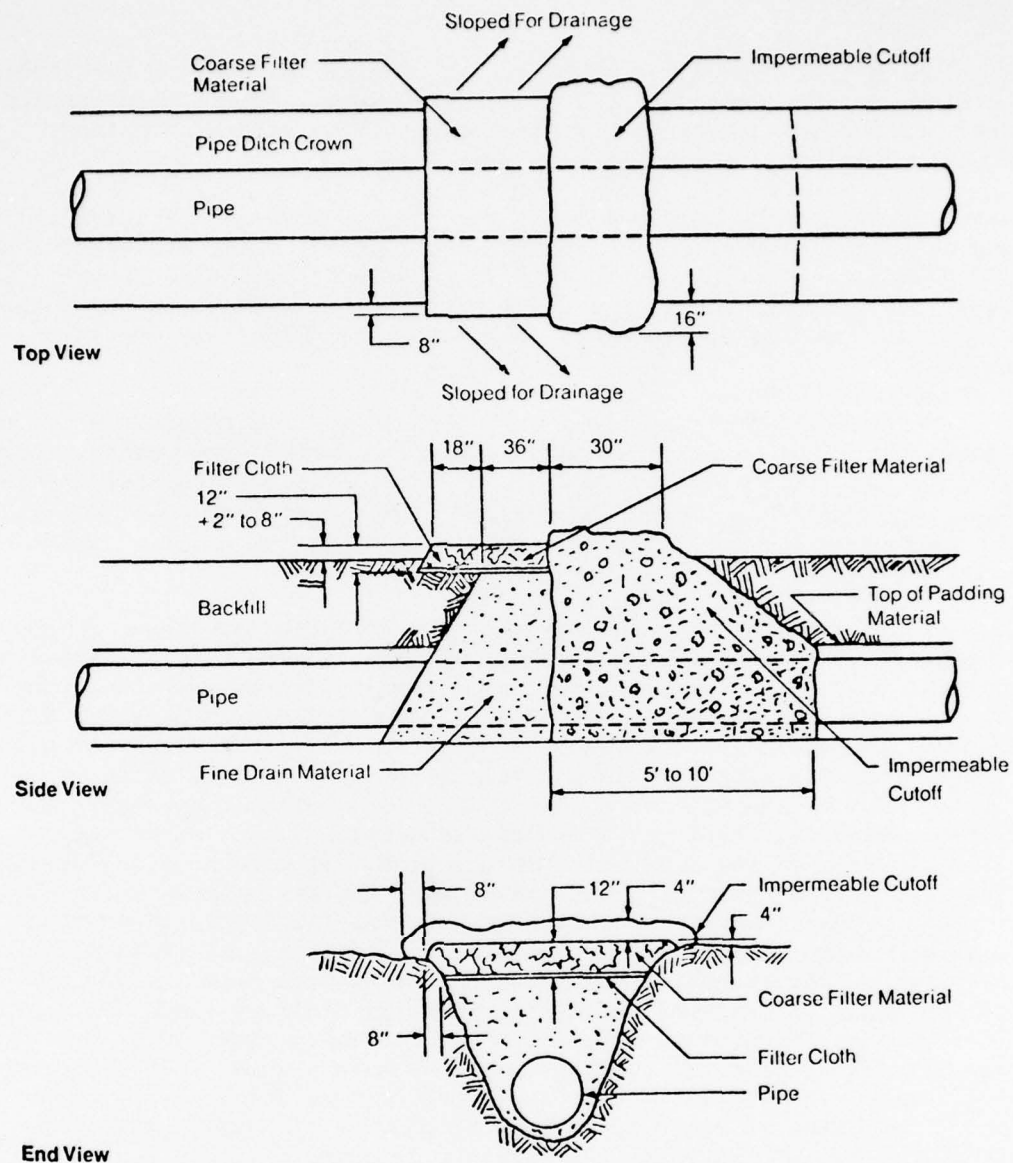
Drawings of pipe ditch plug and typical installation used to protect buried sections of pipeline from subsurface water seepage. (Source: Alyeska Pipeline Data Sheet: Pipe Ditch Plugs, January 1976.)
